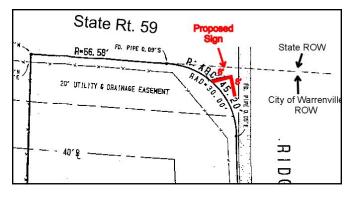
Plat of South Corner, Rt. 59 and Ridge Drive, showing ROWs
